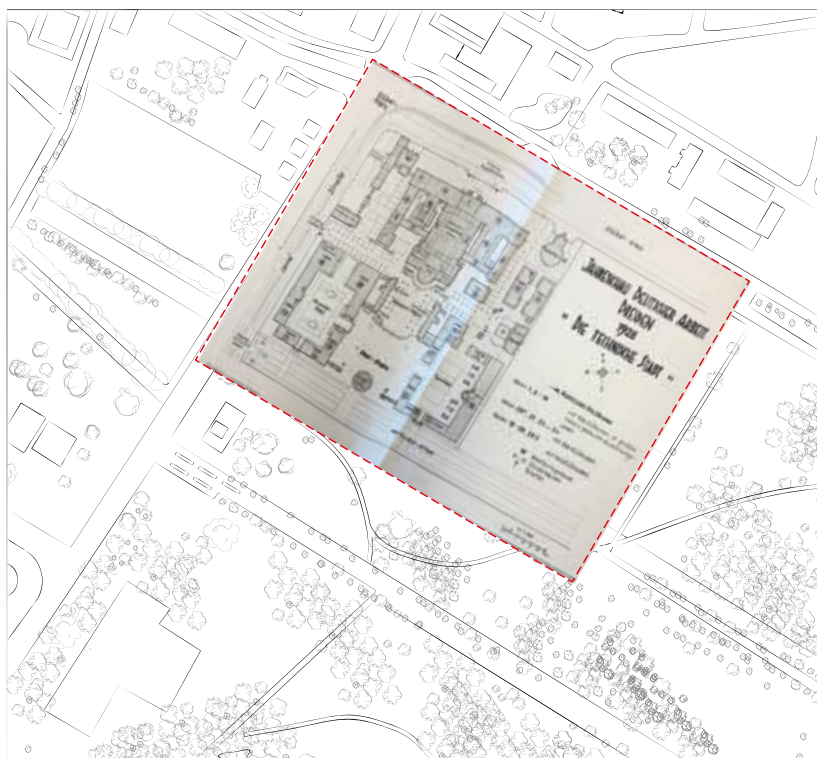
Plan Great Garden, Dresden, 2022, drawn by the author. Inset exhibition plan from 1928.
